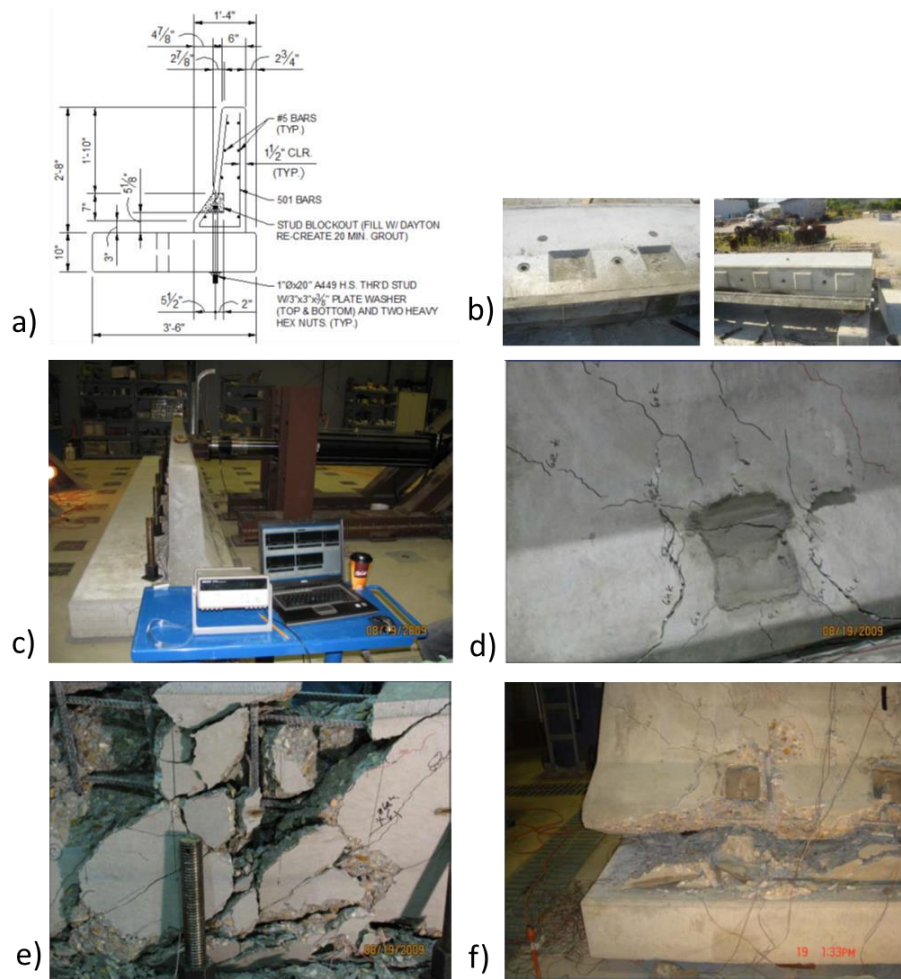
Research conducted at LTRC: a) Detail of bolted connection, b) Placement of shear keys in the precast barrier and deck, c) Test setup for the full-scale specimen, d) large interface cracking, e) Barrier supported by anchor rods at the loading place, and f) crushing of concrete around anchor bolts [10].
